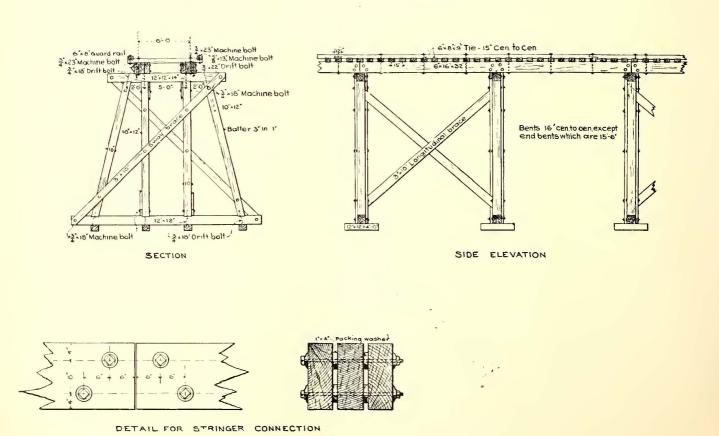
STANDARD TRESTLE CONSTRUCTION
